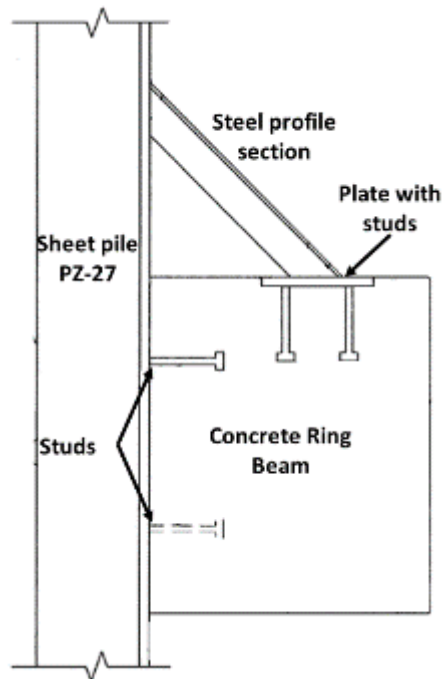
Picture of steel profile welded to the top face of the ring beams.
